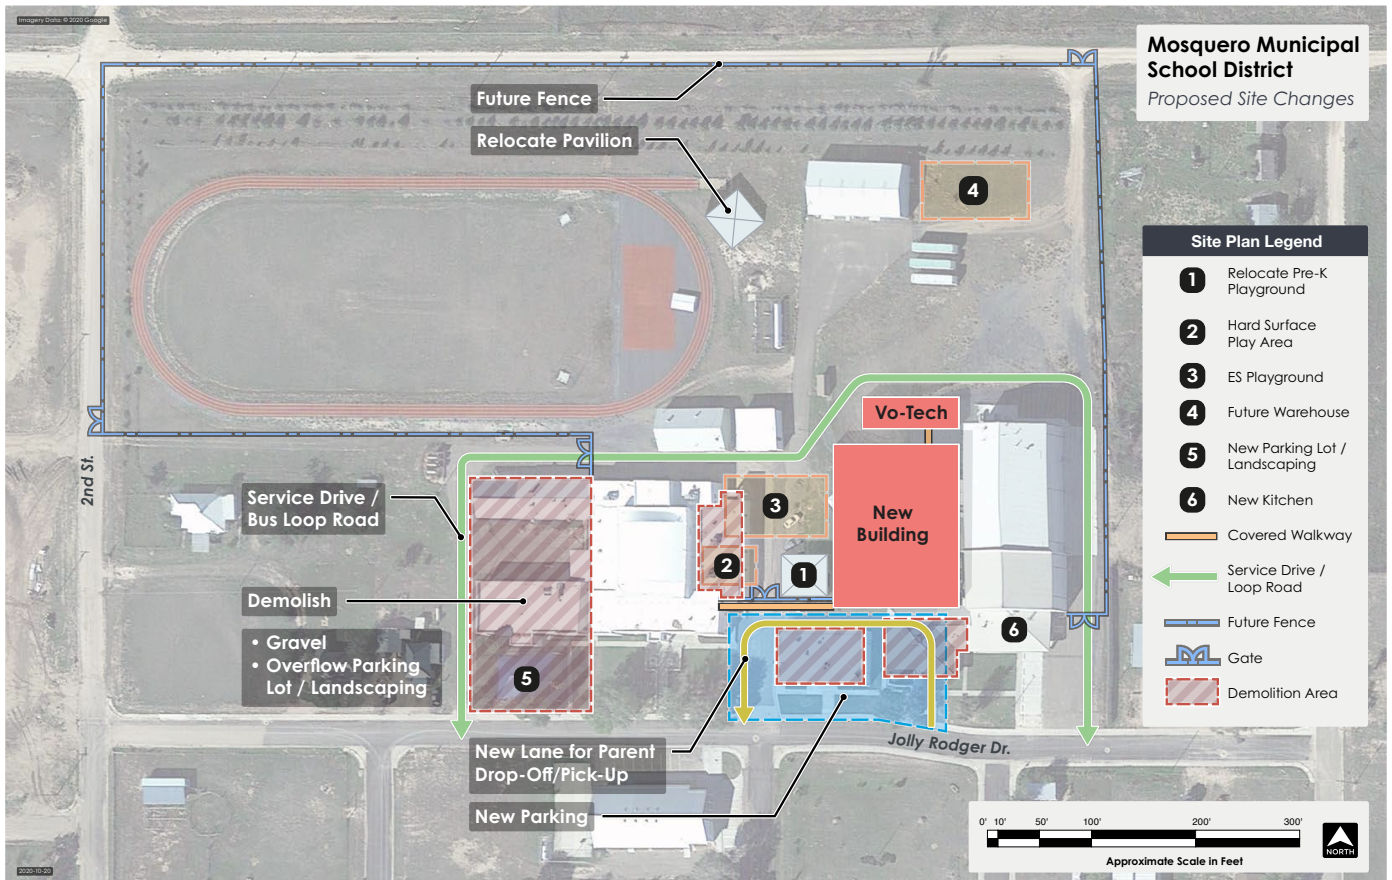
illustrates the new facility inserted into the site and shows which buildings would be demolished. With this configuration, the new building could be built north of the current Elementary School Building, without interruption of academic studies or a temporary relocation. The students can use the city park across the street for supervised play. Once it's built, then the demolition would occur and site improvements would commence.
